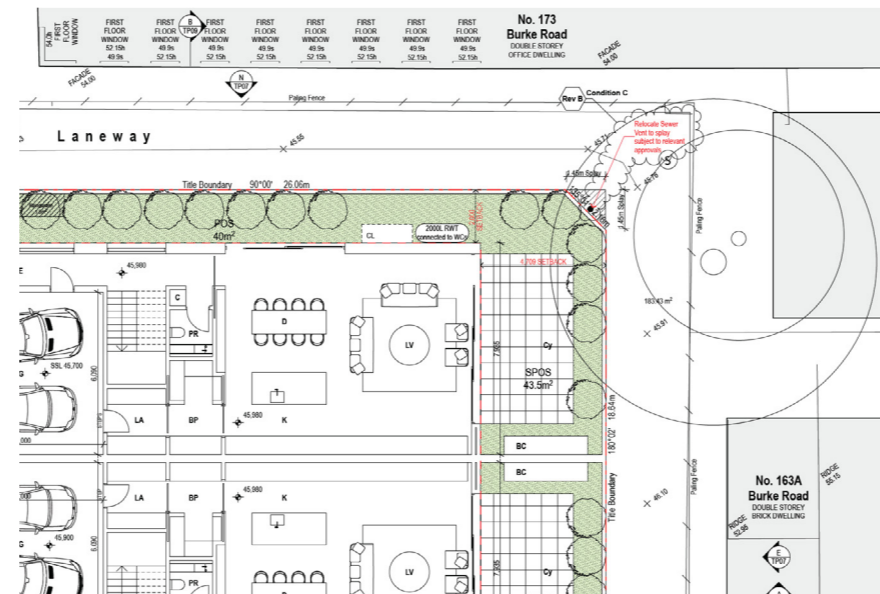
Ground Floor Plan of townhouses at 25 Irymple Street
